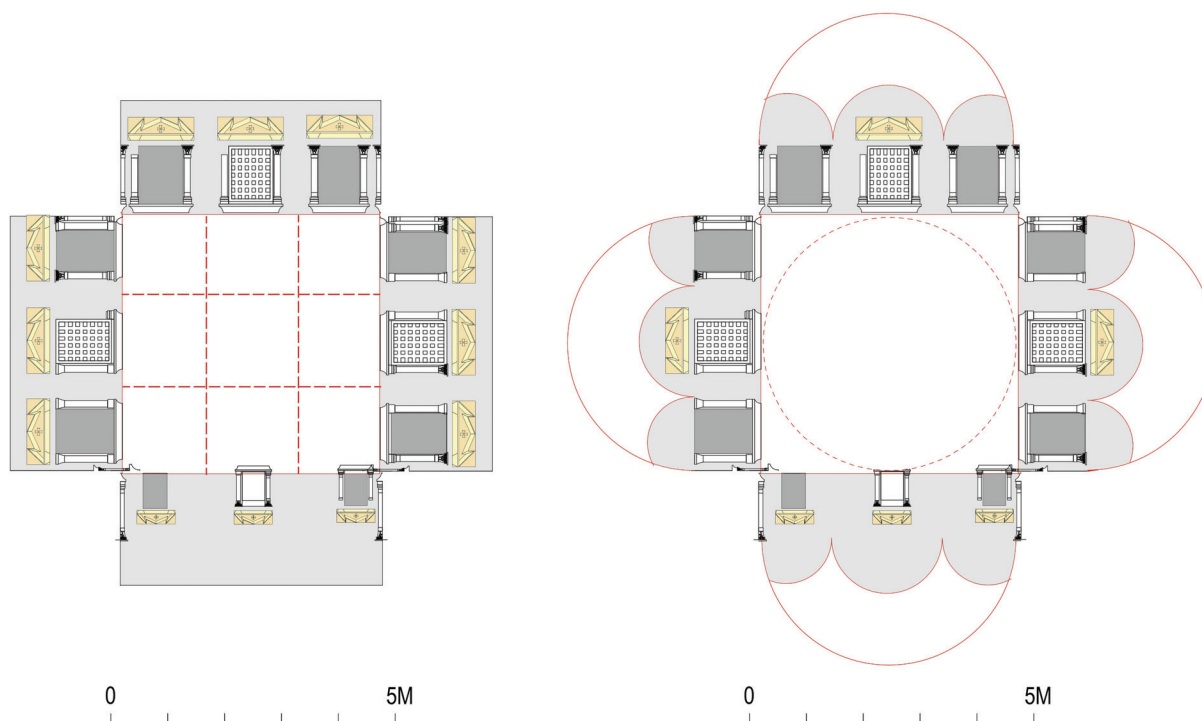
Reconstructed ceiling plans of the sanctuary crossing with fold-out elevations of clerestory. Left: flat roof with possible subdivisions and pediments over all windows/niches. Right: composite dome with conical squinches and pediments over central windows (drawing: author, 2014)
